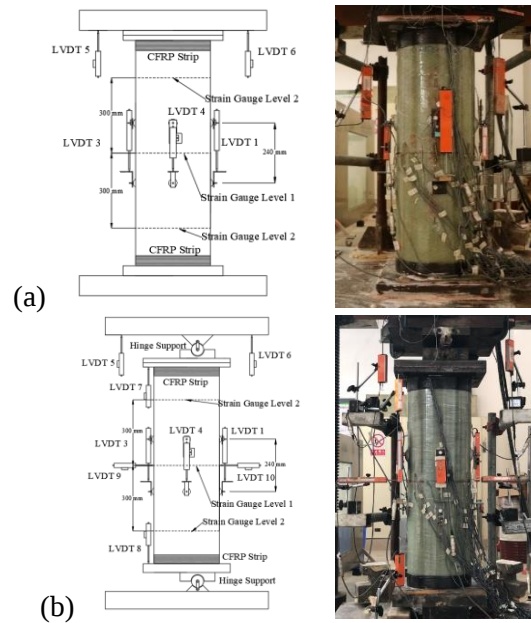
Test set-ups: (a) concentrically loaded columns; (b) eccentrically loaded columns
